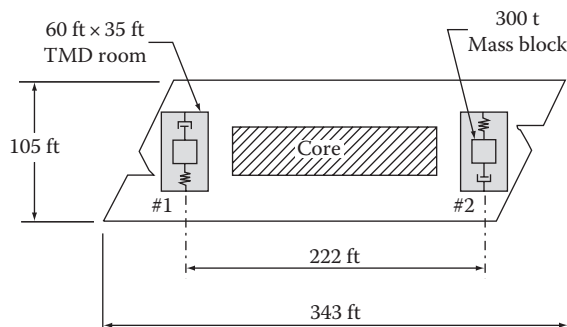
Dual TMD: John Hancock Tower, Boston, MA.
